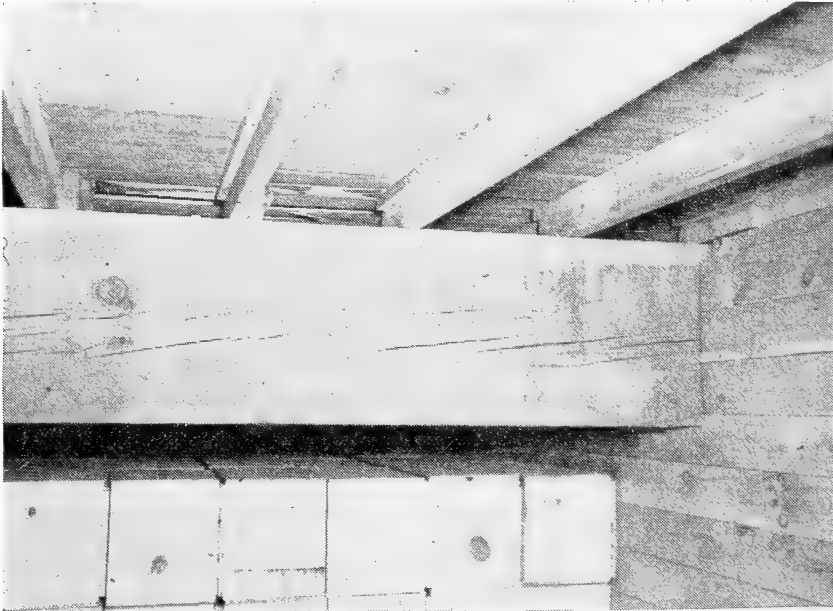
Insulated ceiling raised 4 inches above lower edges of joists, to allow air to circulate over girders. Where the direction of air flow between ducts is transverse to girders, this is important to prevent pockets of stagnant air and higher temperatures in bays near the ceiling.
